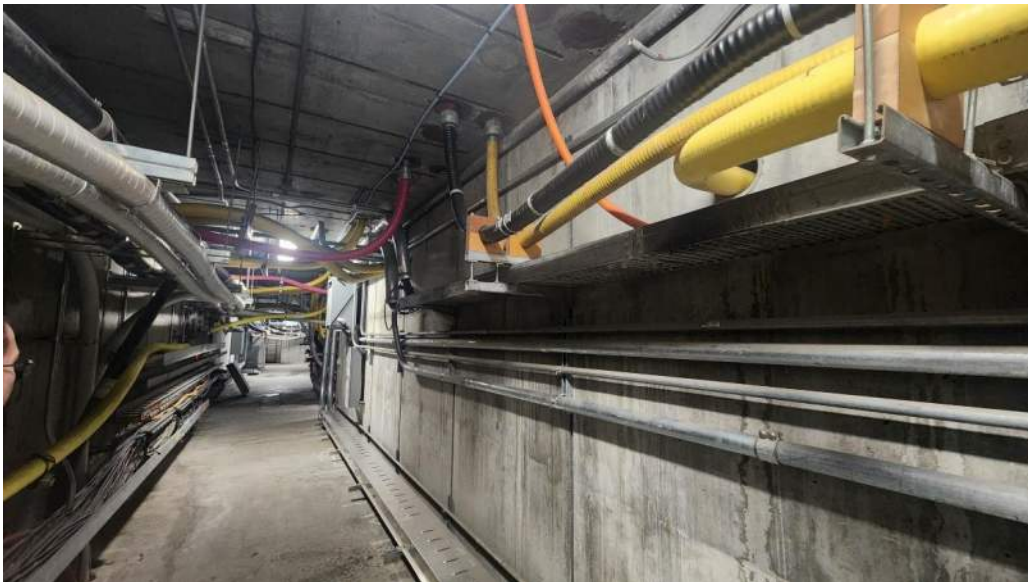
Cable Gallery under ERS Switchgear. Cables are distributed from the cable gallery to the tunnels.
